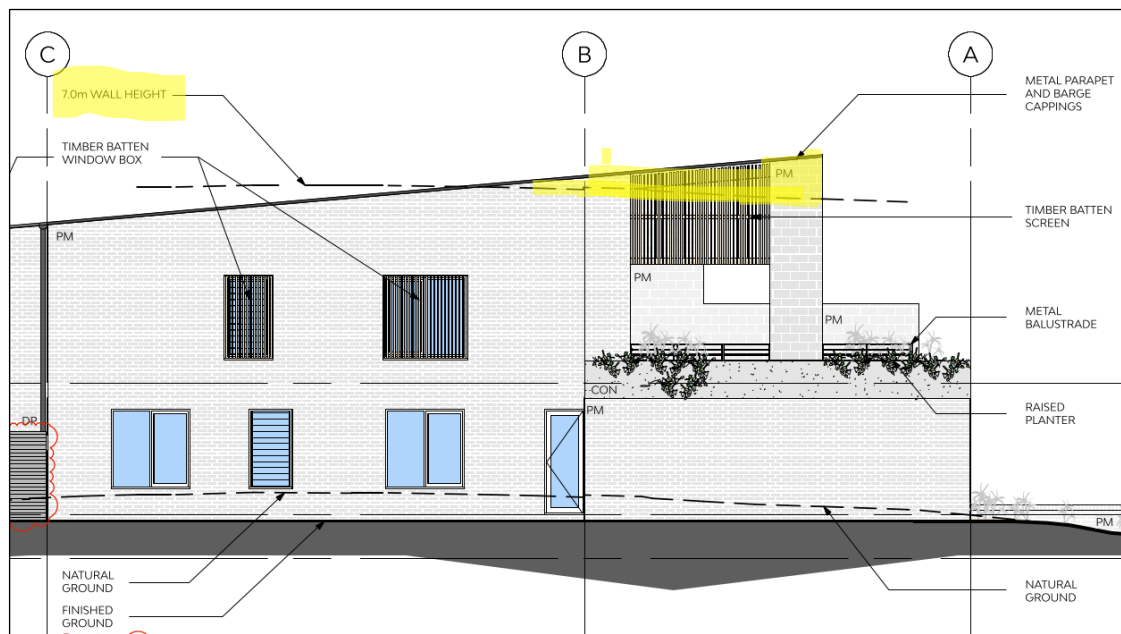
Extract from elevation plans showing extent of non-complying wall height
